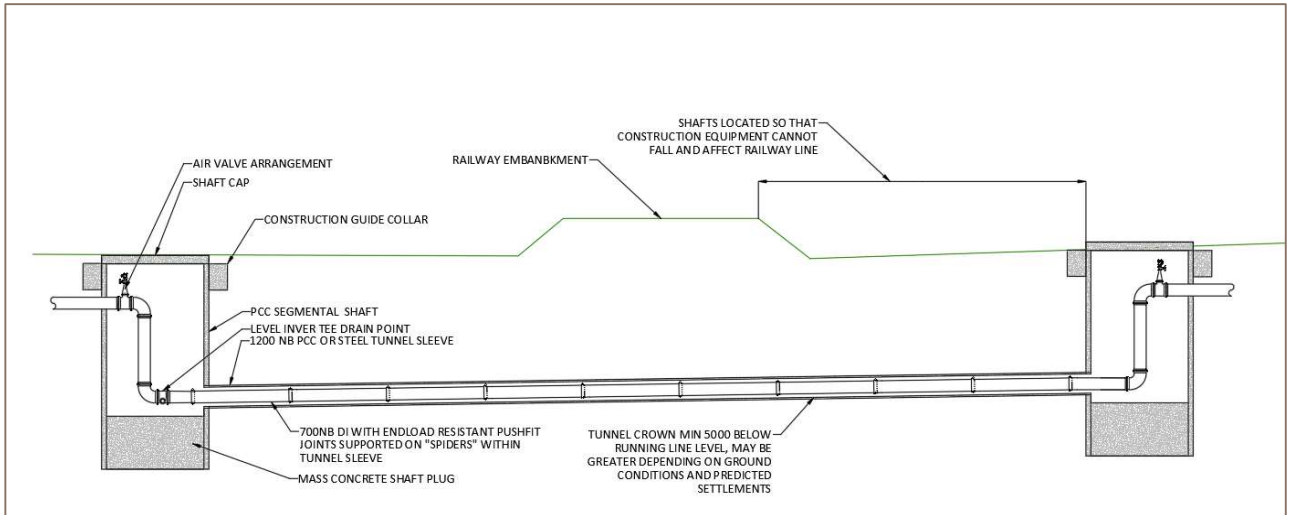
Rail Crossing Tunnel Typical Arrangement
